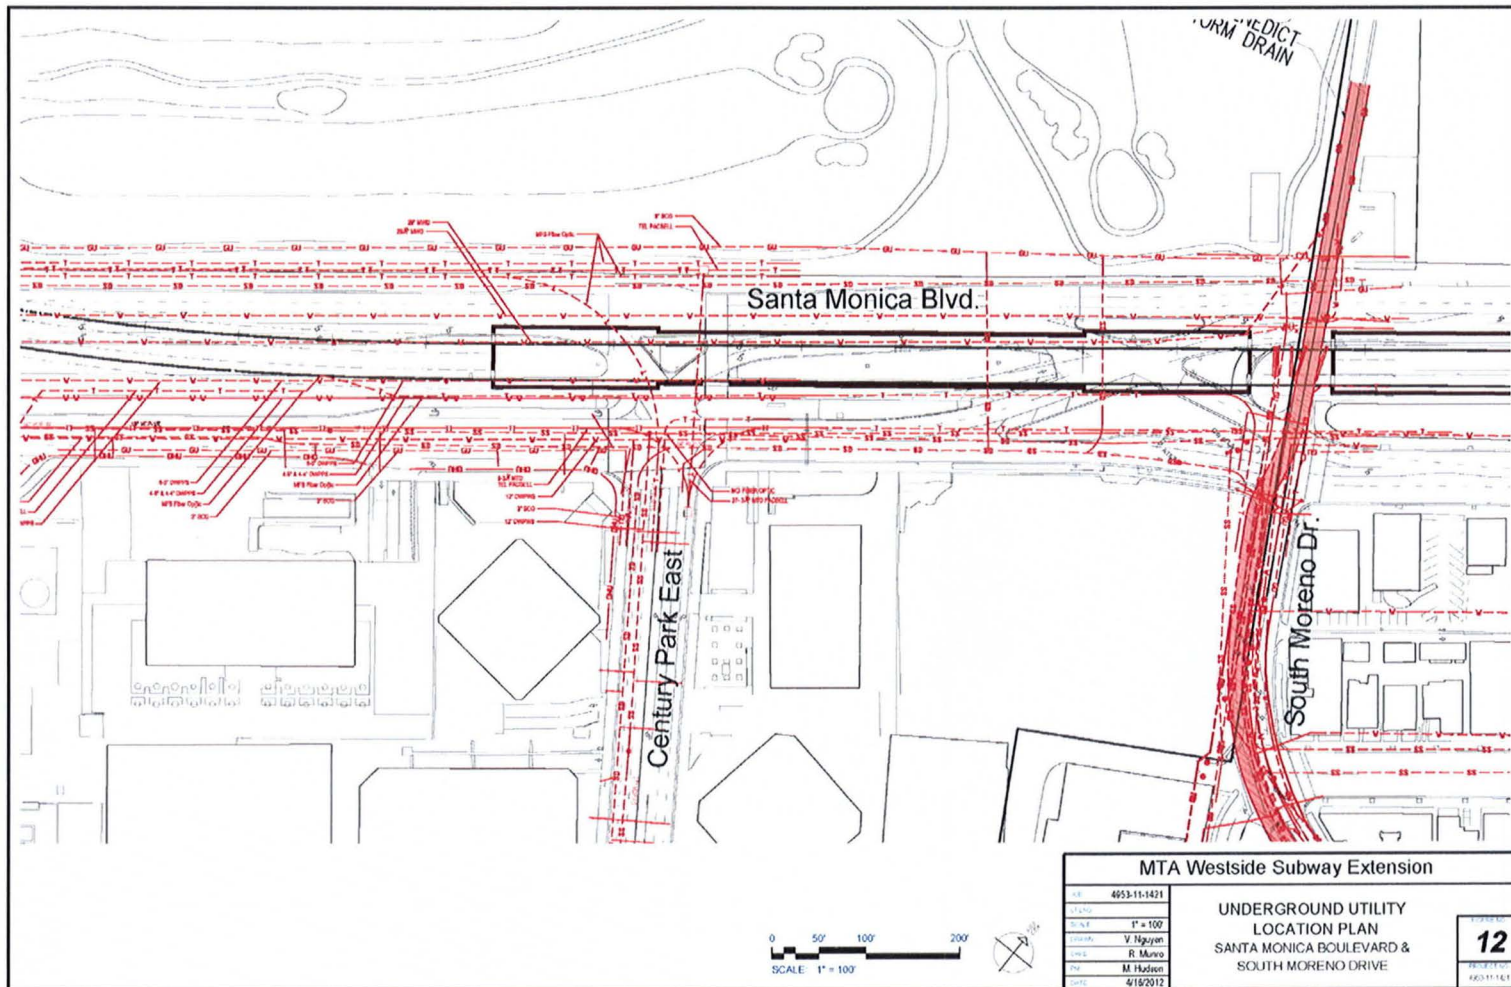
Underground Utility Location Plan, Santa Monica & South Moreno Drive
